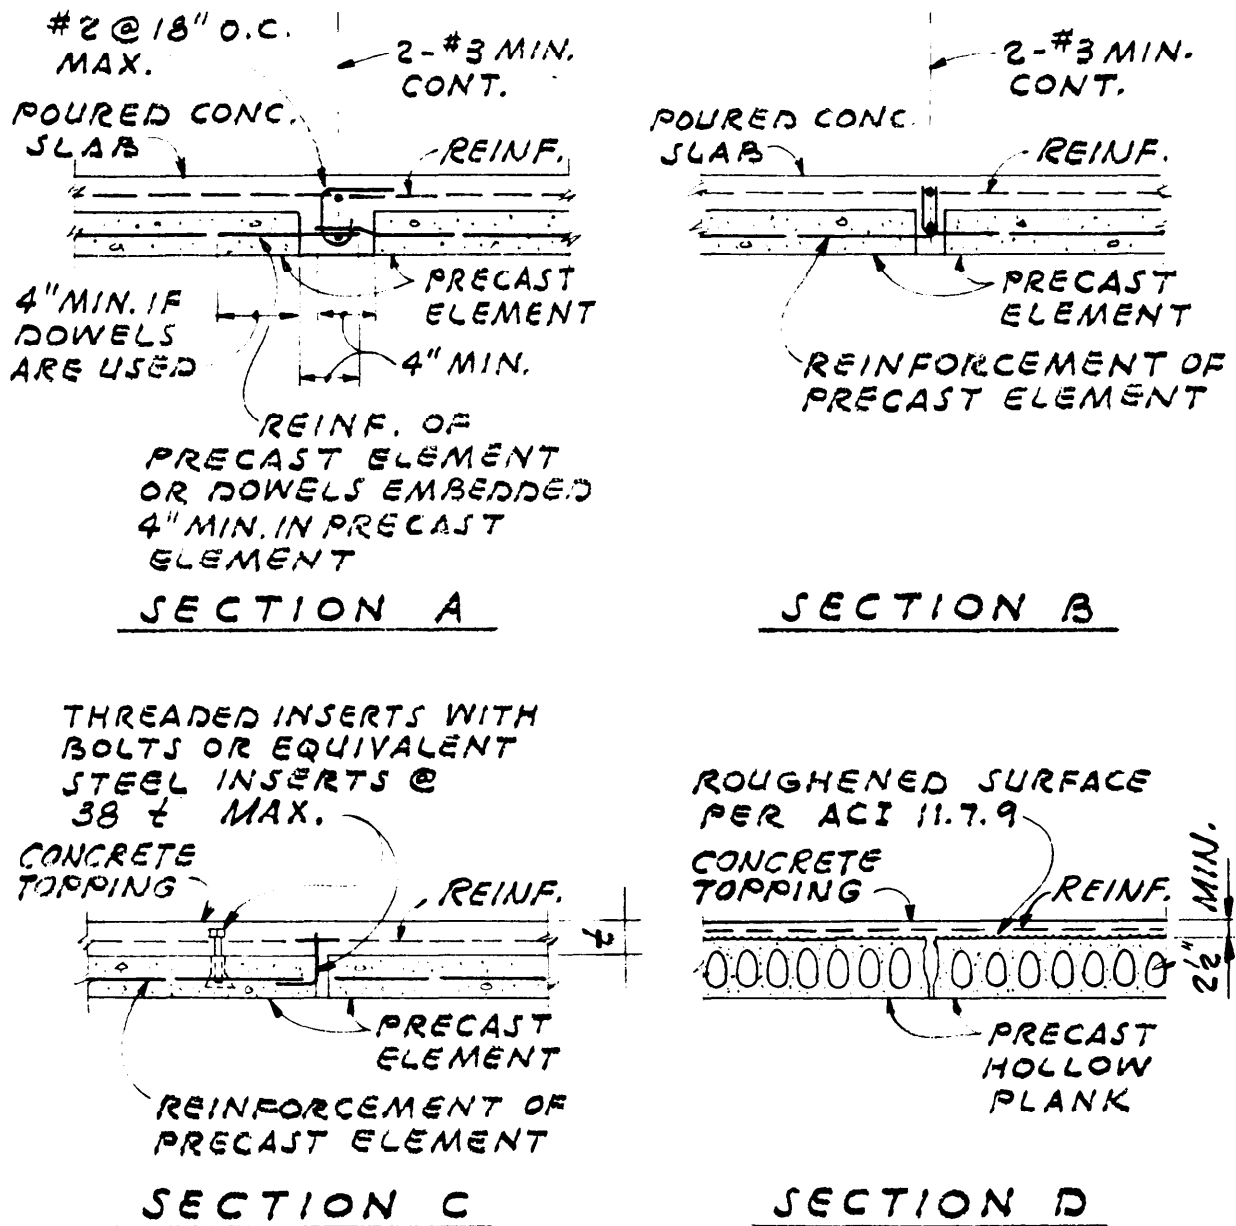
Attachment of superimposed diaphragm slab to precast slab units.
